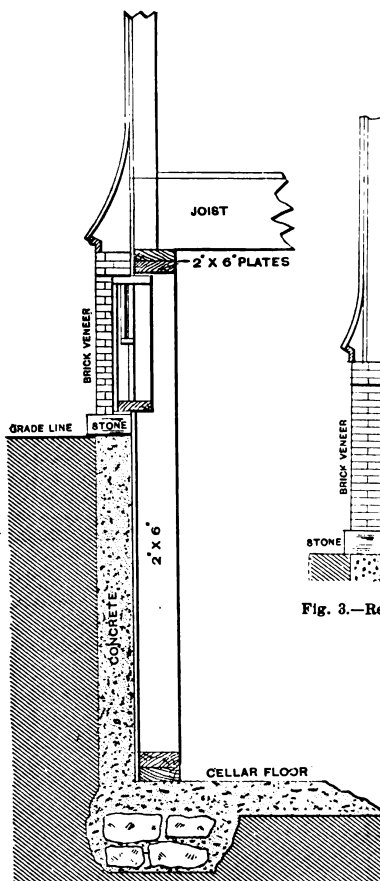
Section Showing Stone Footing Course, and Brick Veneer Finish above Grade Line.—Scale, $\frac{1}{4}$ Inch to the Foot.
